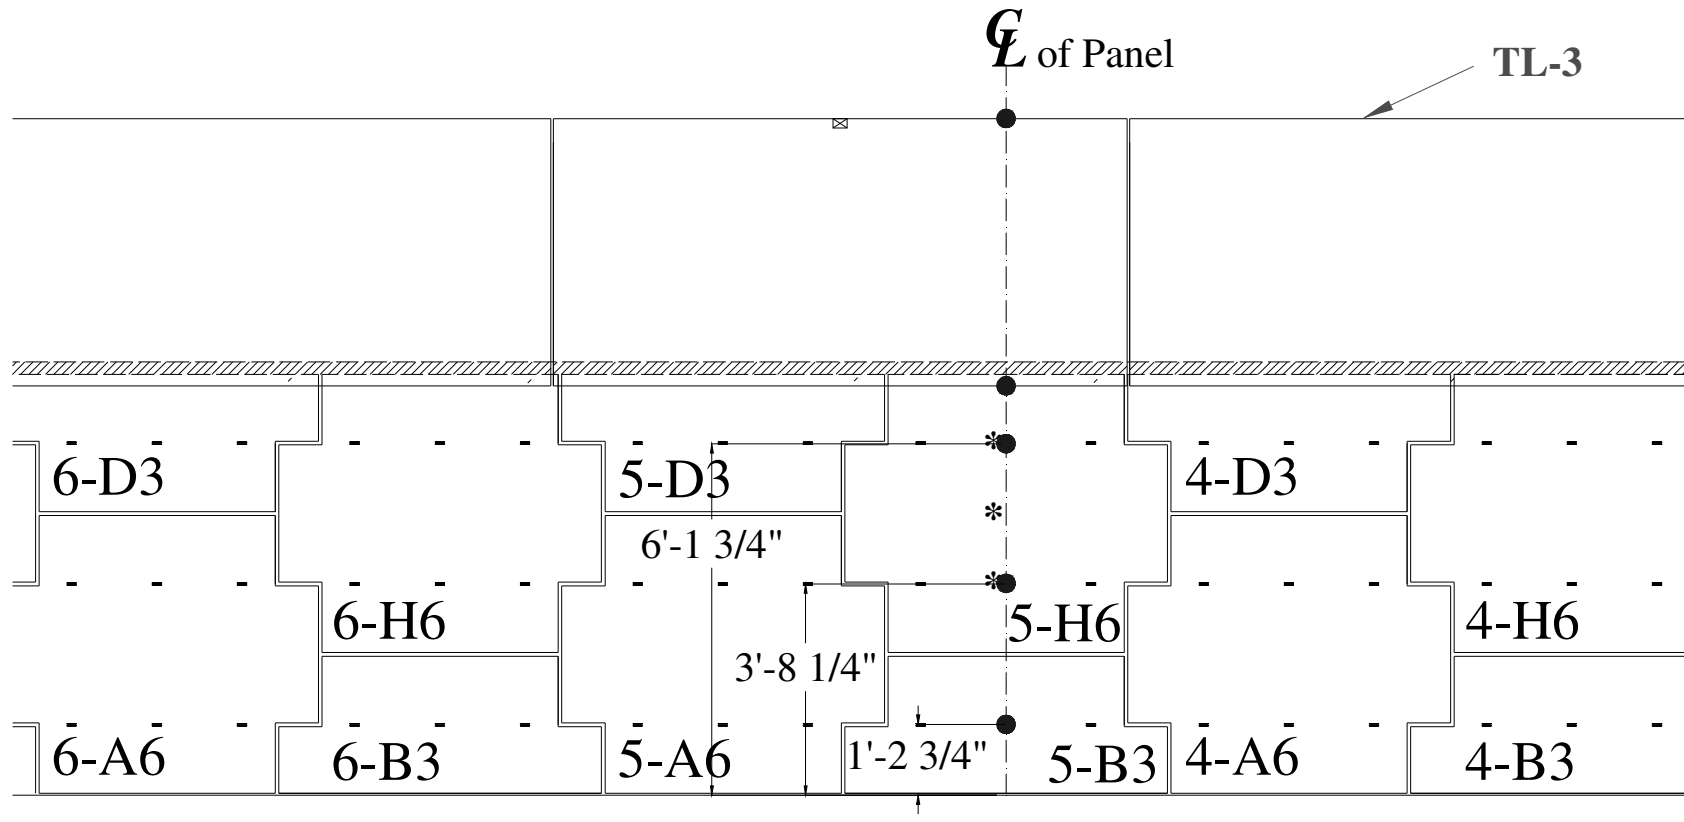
Location of Displacement Bars on Wall Panels (Cont.)
